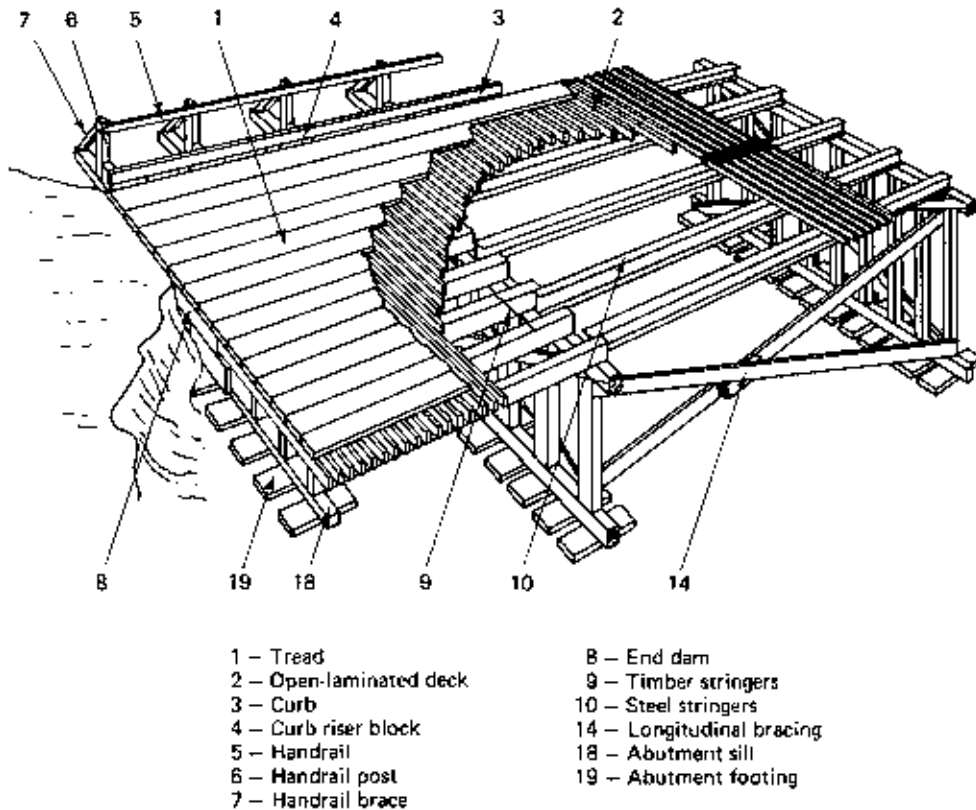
Timber trestle bridge with frame bent. (U.S. Department of the Army)
